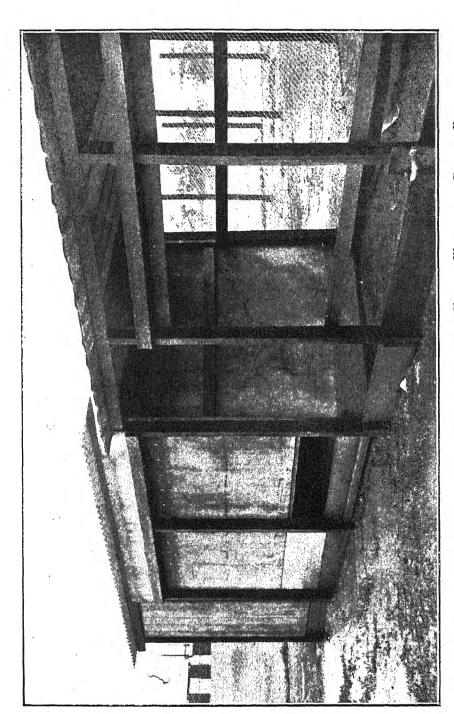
Back View, showing a Completed House and Framing Walled with Roofing Felt.
